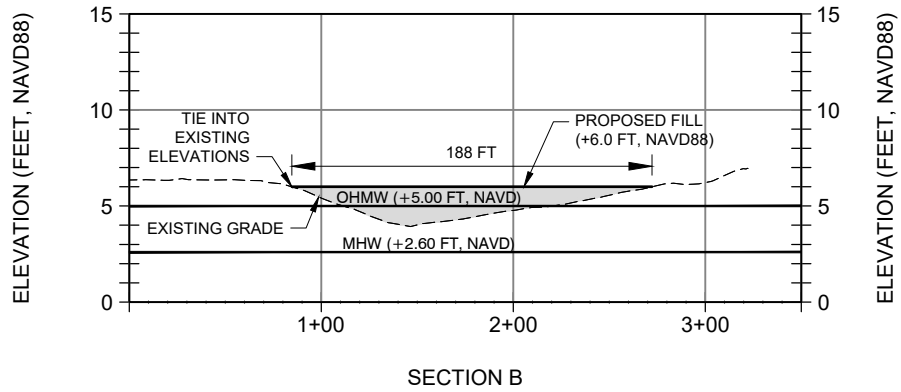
ALTERNATIVE 2 CROSS SECTIONS & DETAILS
